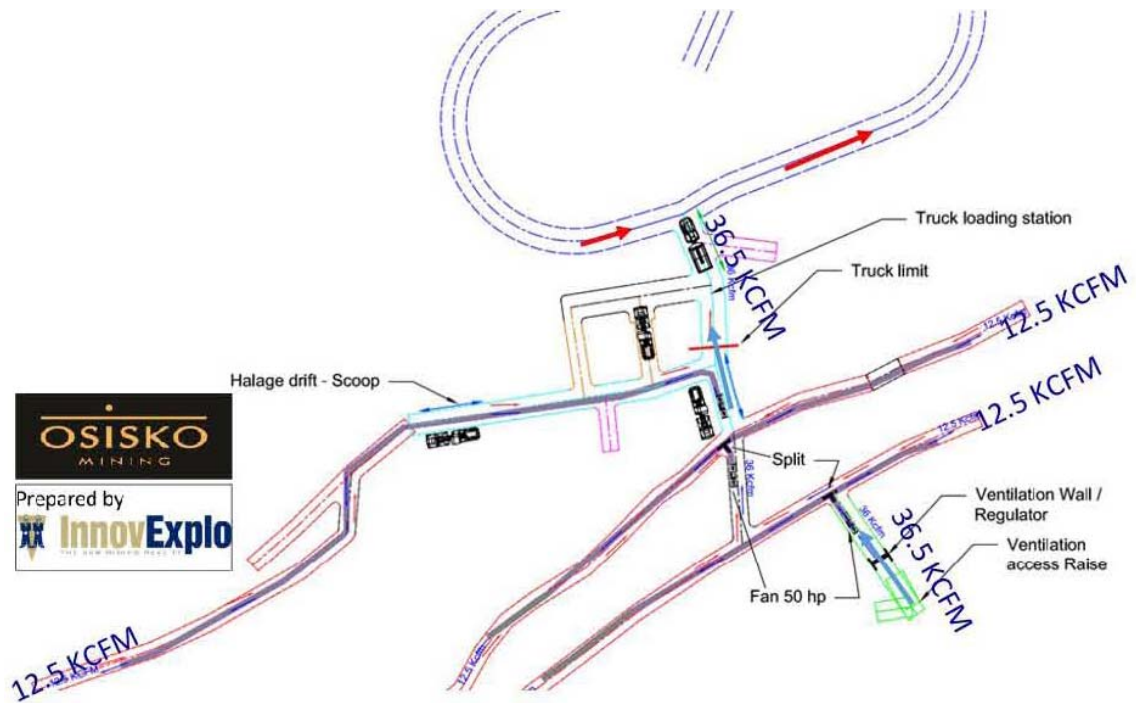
Typical layout for auxiliary ventilation in the Main and Underdog zones.
